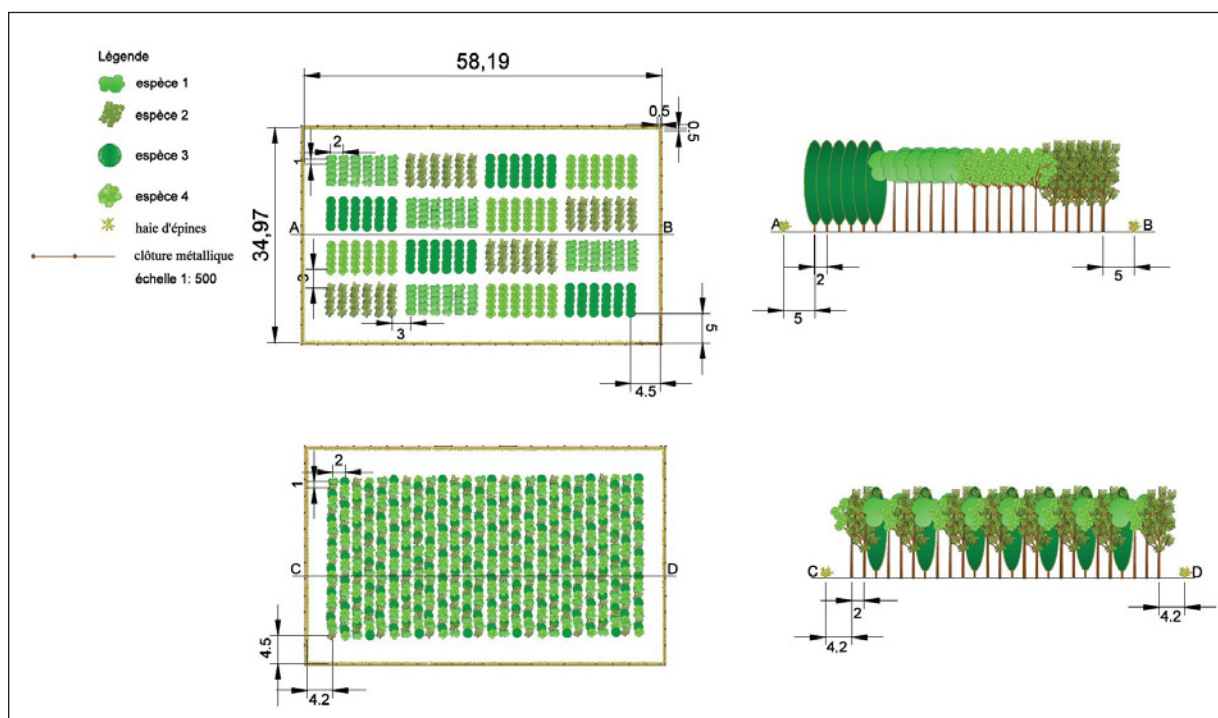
Taghit (Algeria) – scheme of treated wastewater: plan and sections.
